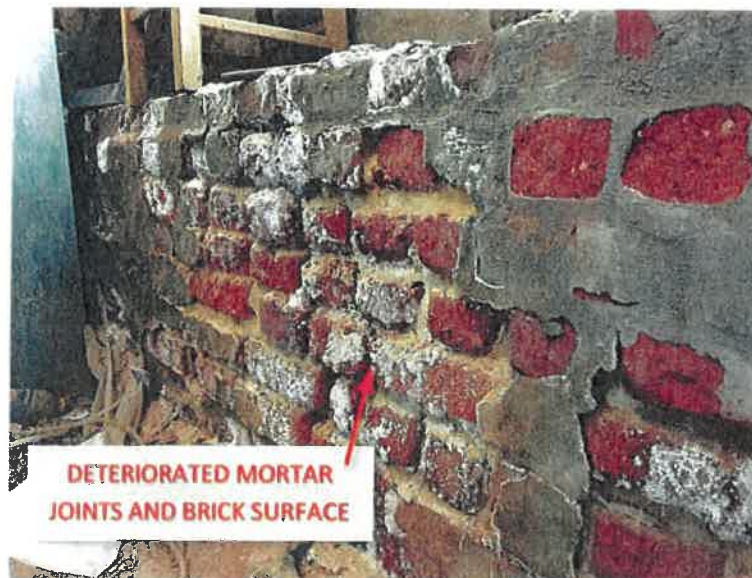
Deteriorated Mortar at Brick Masonry Inner Surface
